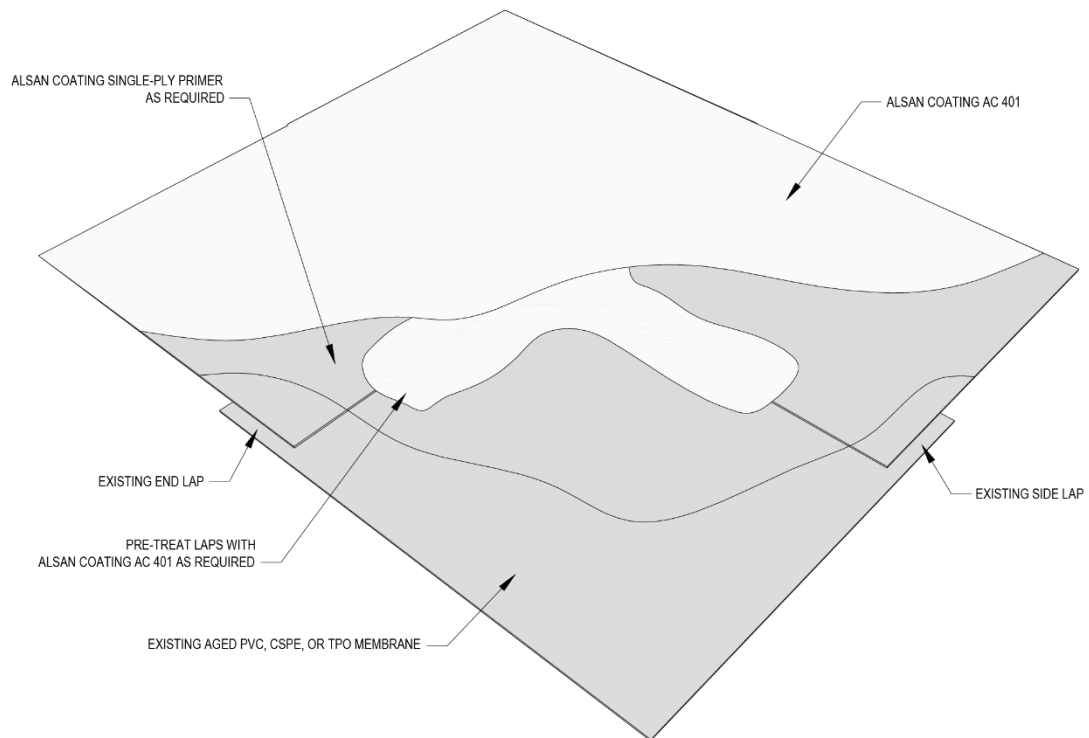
Acrylic Roof Coating Over TPO/CSPE/PVC, Side/End Laps
